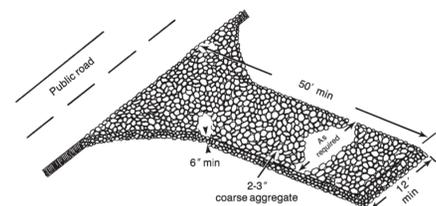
Gravel entrance/exit keeps sediment from leaving the construction site (modified from Va SHWC).
